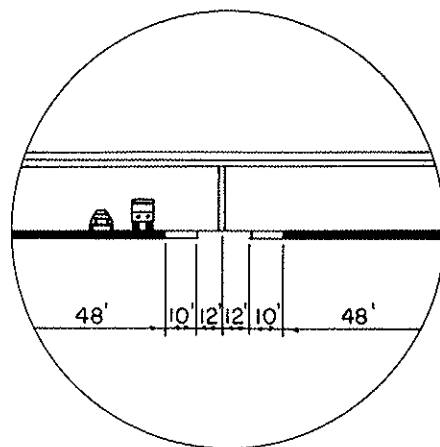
TYPICAL FREEWAY CROSS SECTIONS
